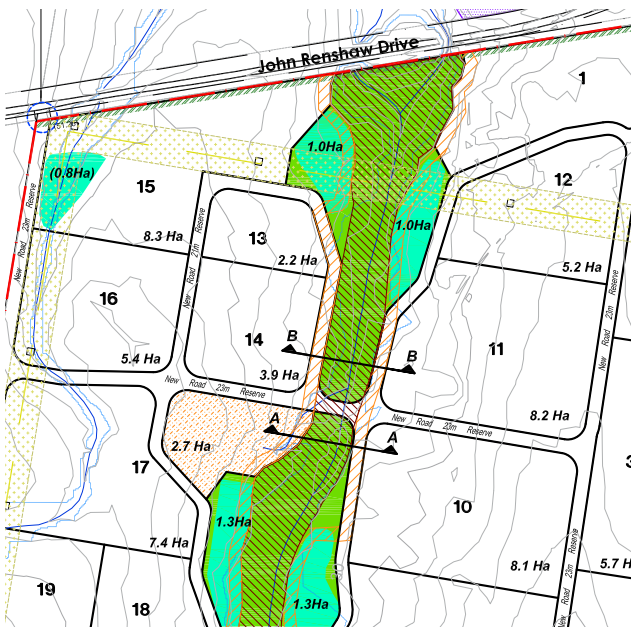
Key Plan - Sections A-A and B-B
